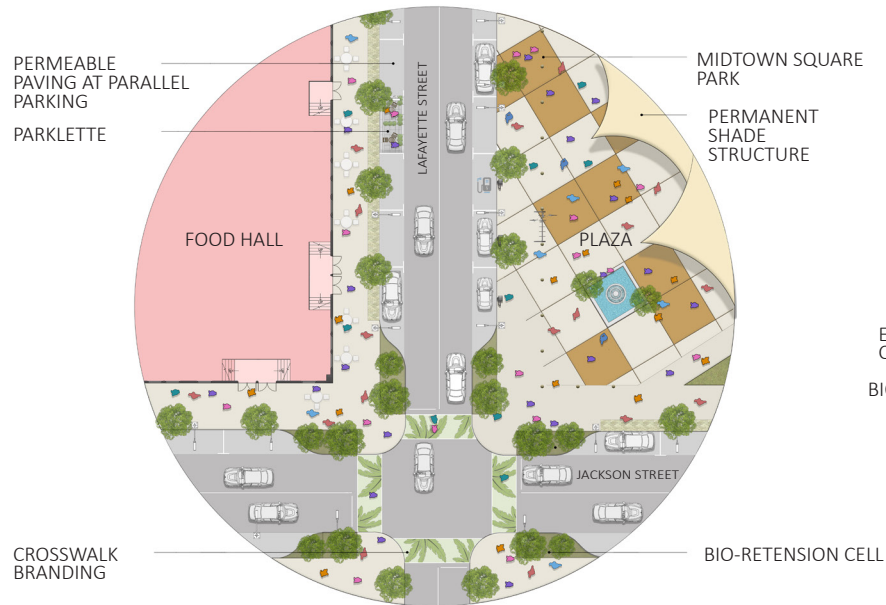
Plan of Intersection at Lafayette and Jackson
